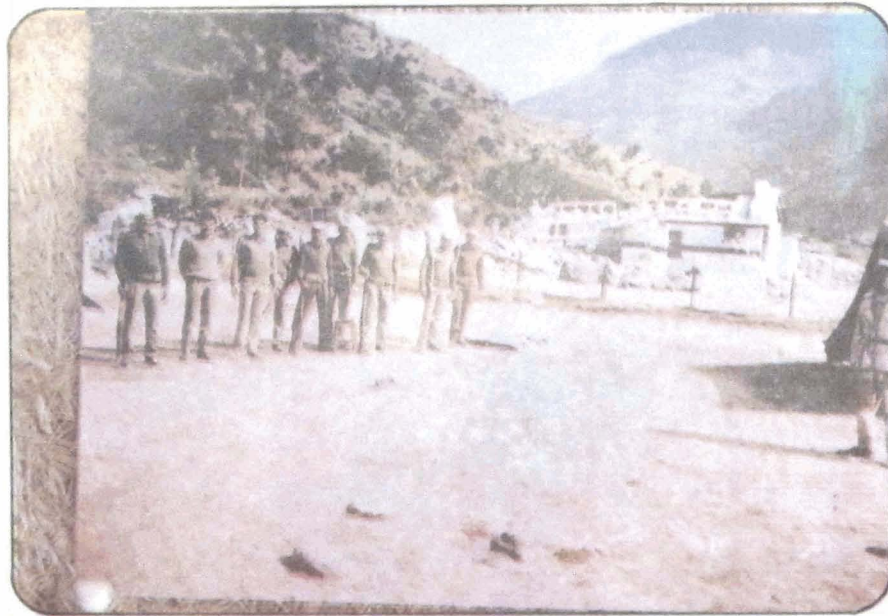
Damaged NW-SE aligned block of Govt. Inter College at Aungi. Note complete collapse of the block oriented in the NE-SW direction behind the policemen.
